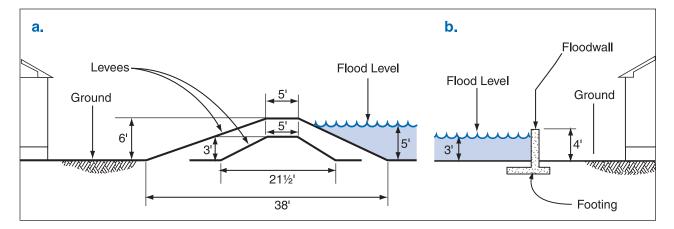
Cross-sections of a typical 3-foot high levee, 6-foot high levee, and 4-foot high floodwall. A 4-foot high floodwall (b) requires much less property space than a 3-foot high levee (a).
